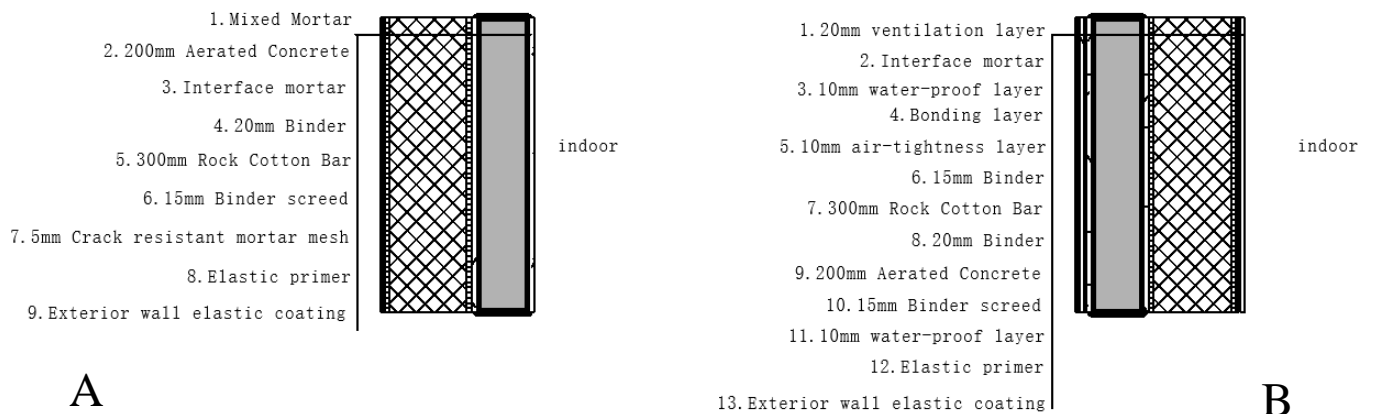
External wall sample of passive houses. A: The wall structure sample of passive houses; B: Reconstructed external wall structure of passive houses.
